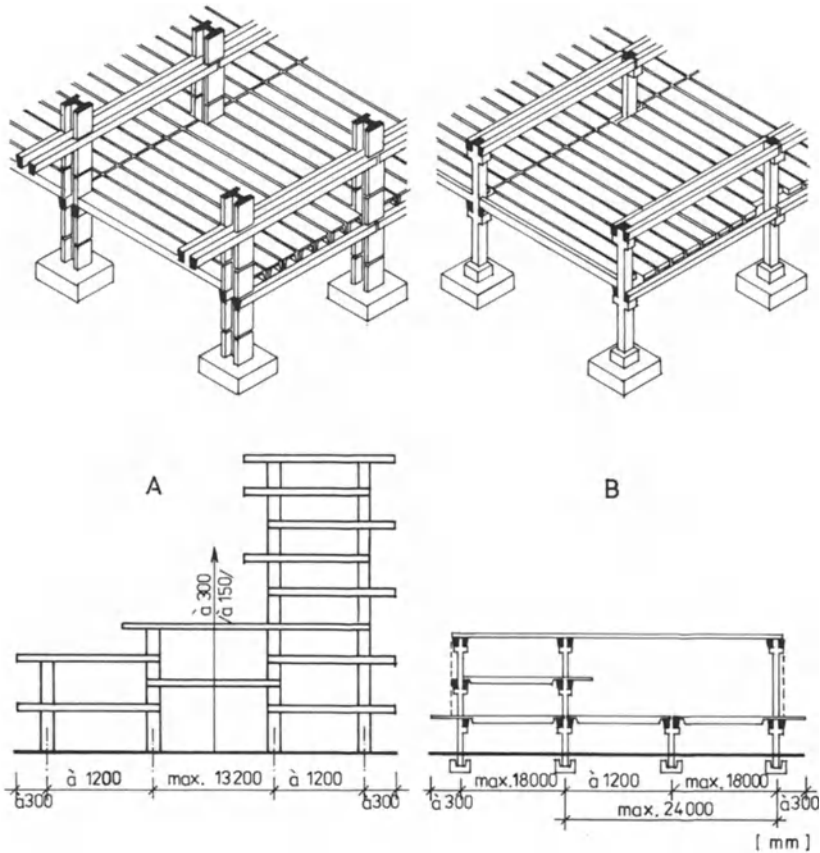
Use of structure with (A) columns of H cross section; (B) continuous columns
